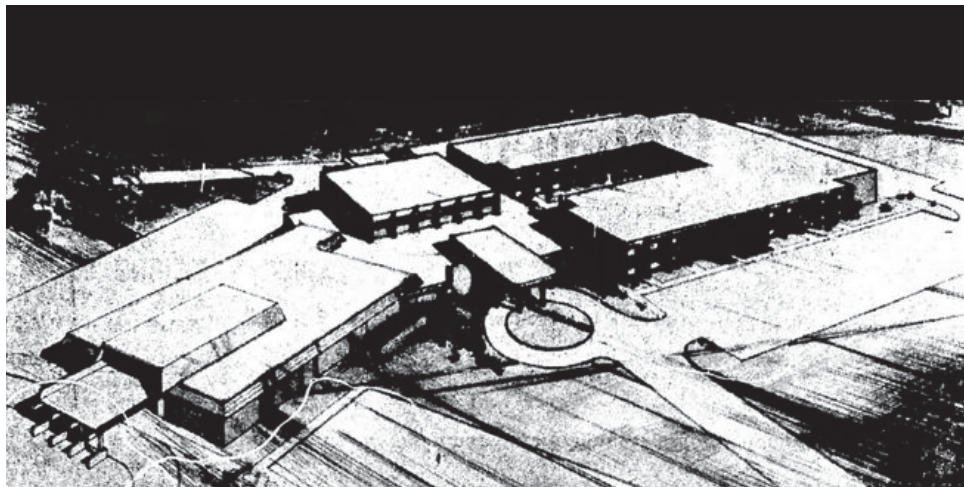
Architect's sketch, 1972, looking northeast (note the elevated motel sign left of center)¹⁵
